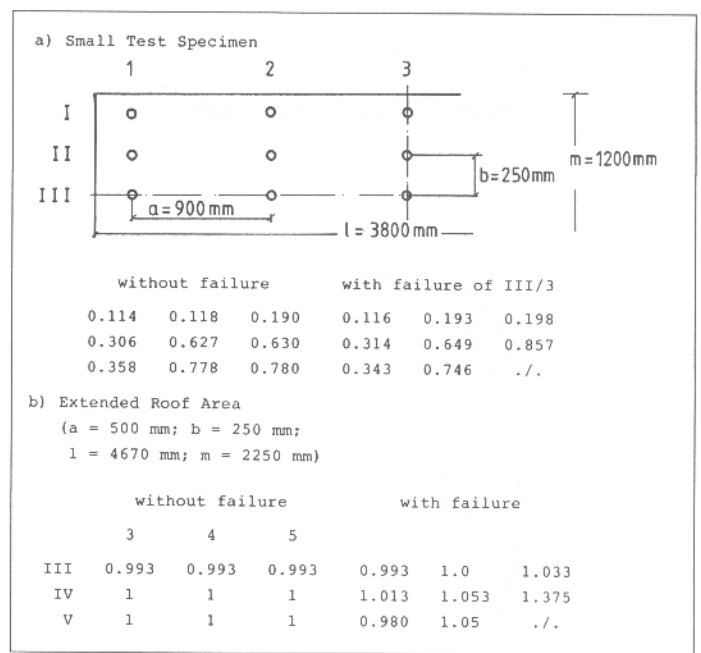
Fastener load before and after failure of the central fastener.
